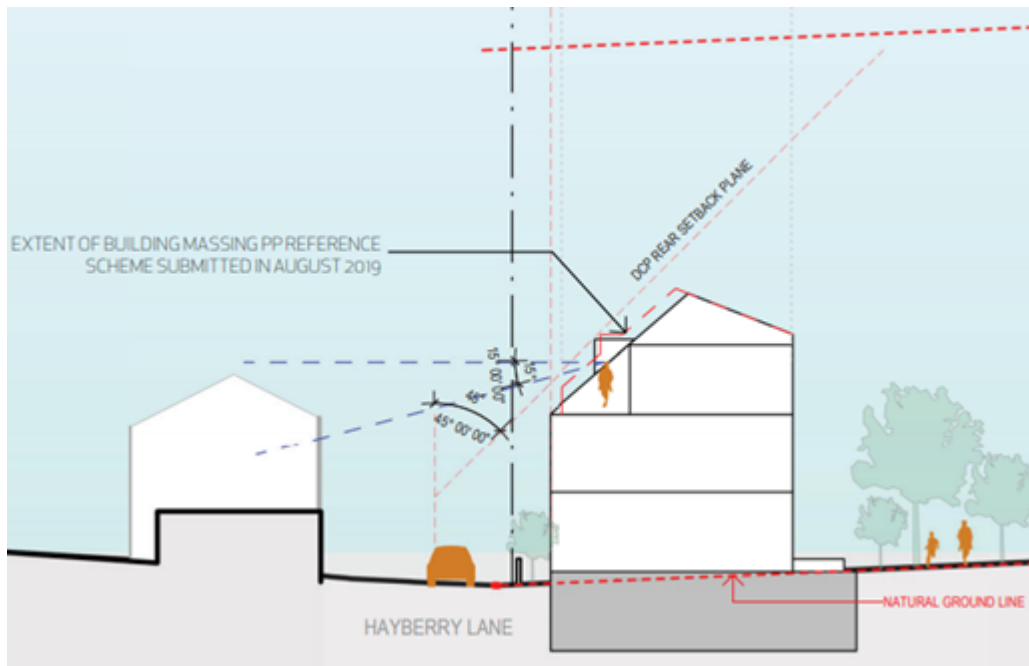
Section indicating relationship of proposed buildings ‘D’ to Hayberry Lane and C to Falcon Street (looking west).
